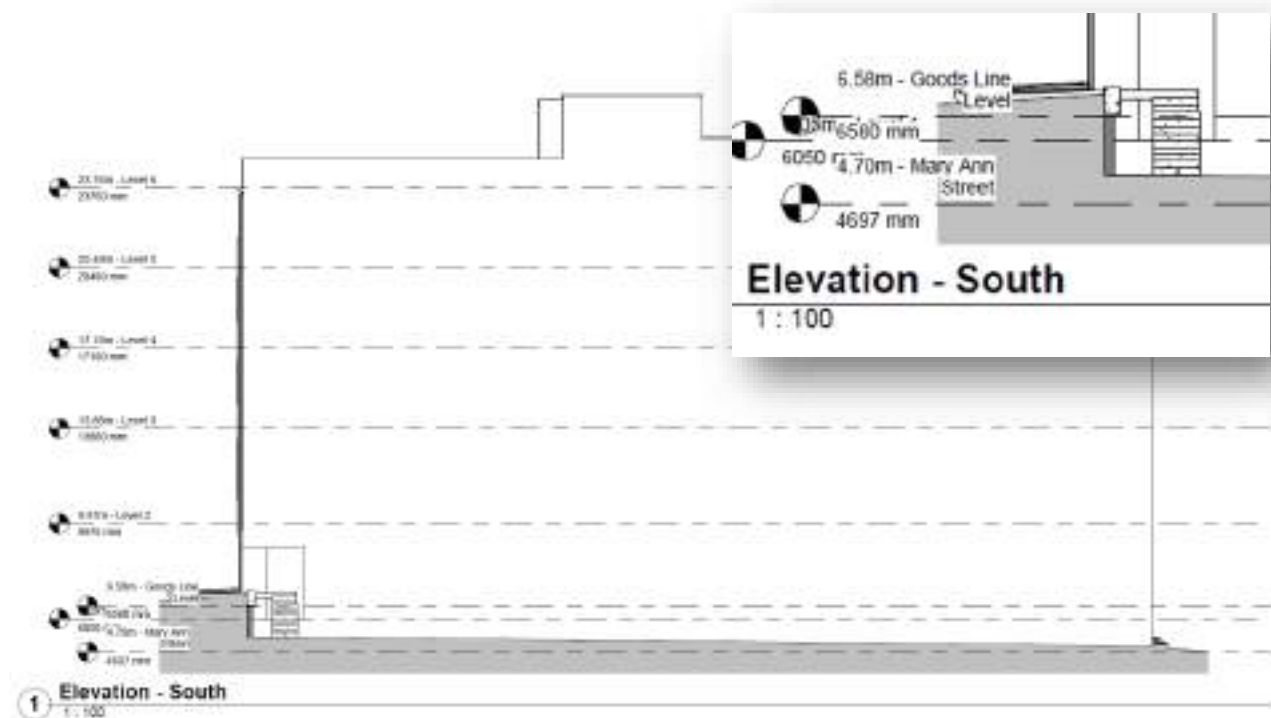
Southern elevation of former Cash Register Building with extent of excavation into western portion of the site (approximately 2 metres) indicated in inset.
